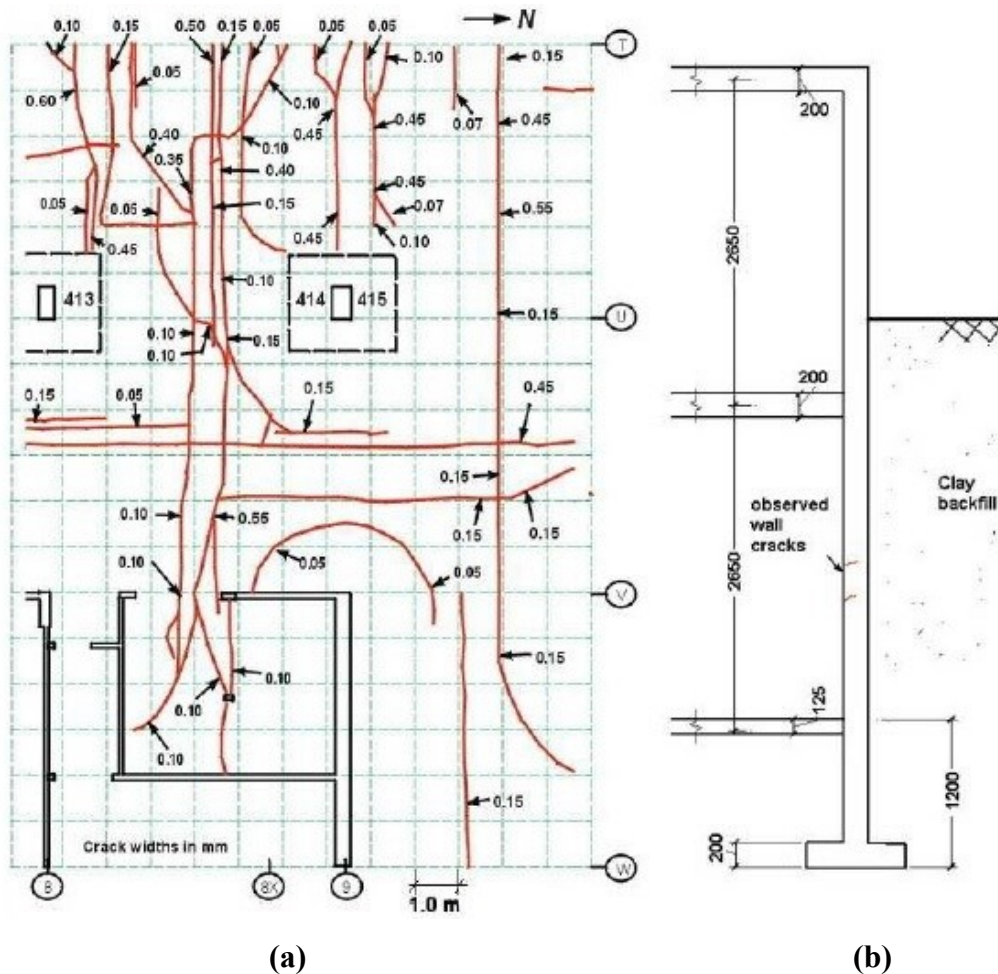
Observed cracks in: (a) the slab; and (b) the foundation wall (Sheikh & Homam, 2004)
